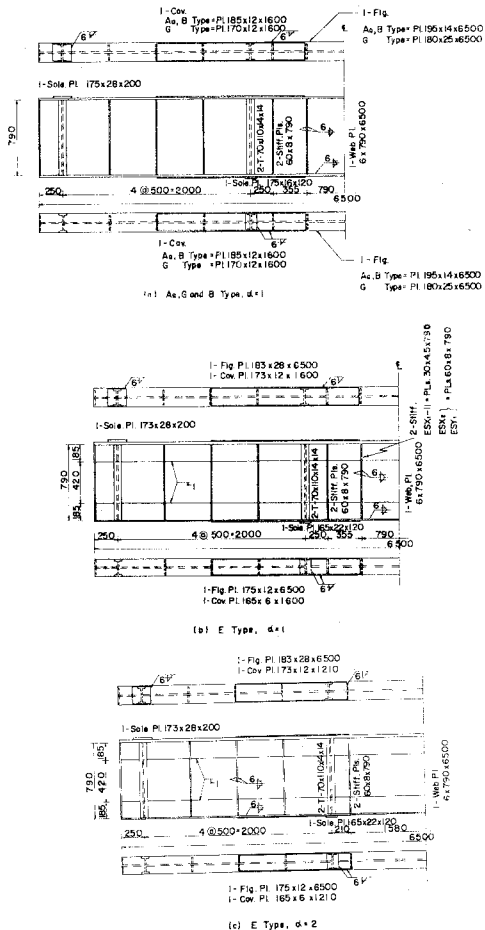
Details of shear Test Girders ($d_w/t_w=130$)
